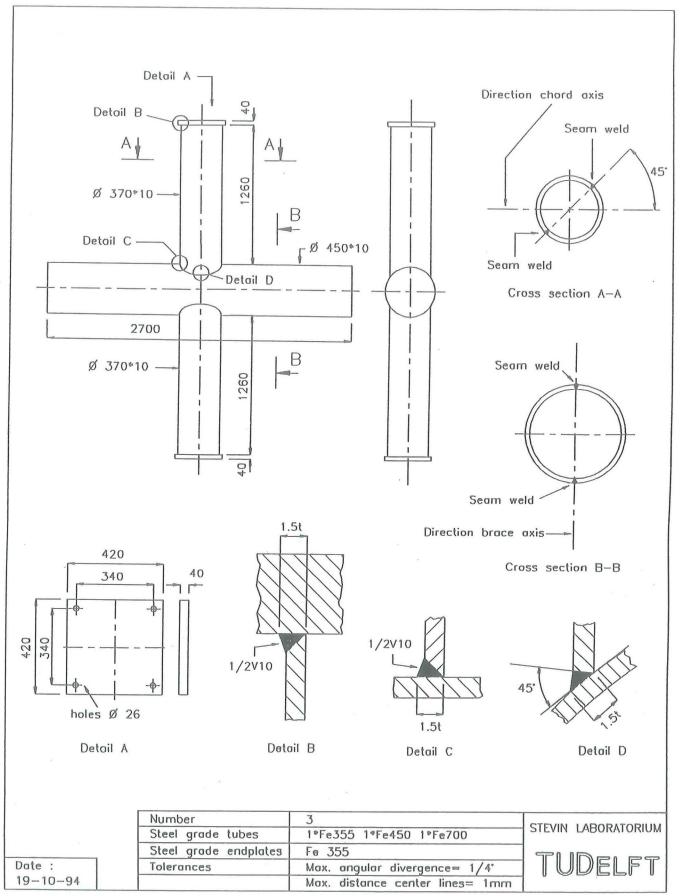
Configuration and weld details for X-joints under compression loading.
